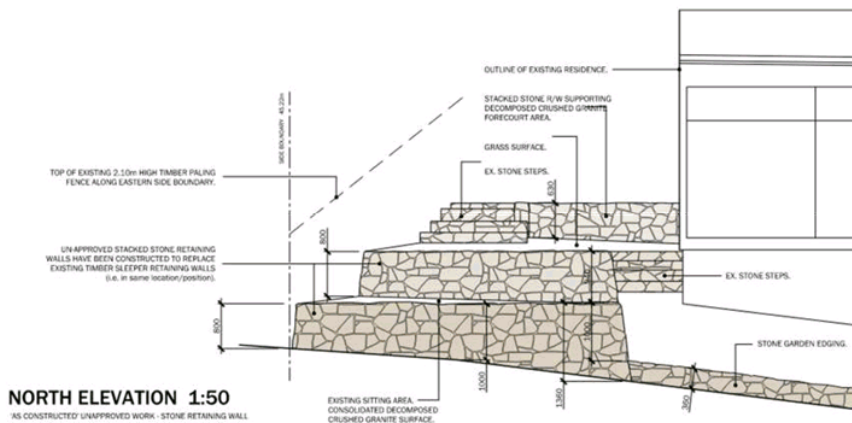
retaining walls within the property creating the forecourt and seating/sitting terraces
